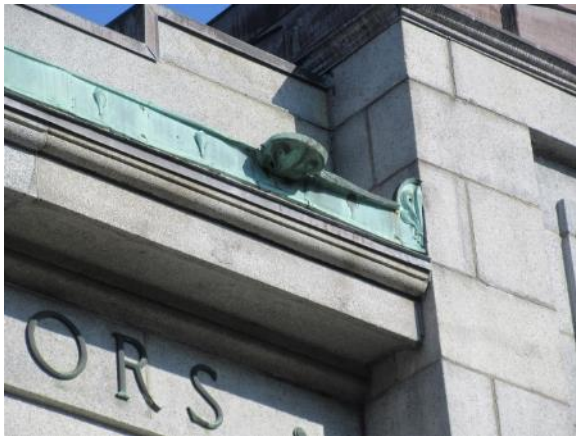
Deflected pendant on the banding on the Front (East) Elevation
